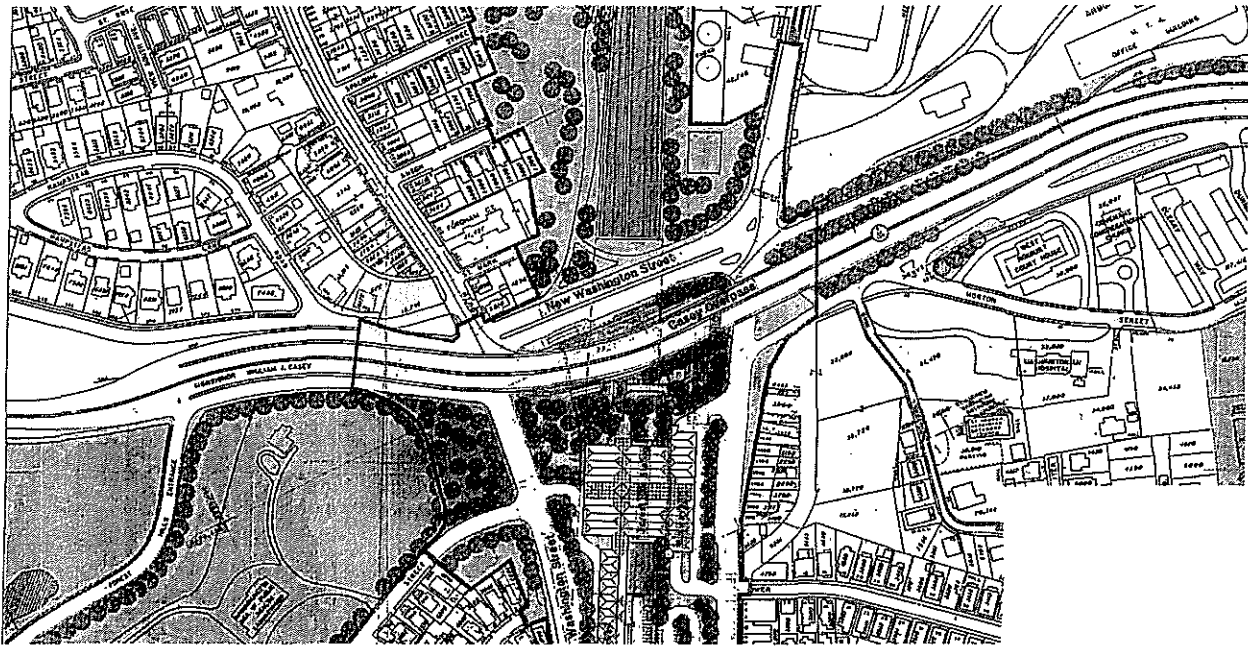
Plan for Southwest Corridor Project MBTA Contract #097-320, Forest Hills Station Site Area Plan by Howard, Needles, Tammen & Bergendoff Dated September 1983, plan #A72790 Sheet 411 of 600.
